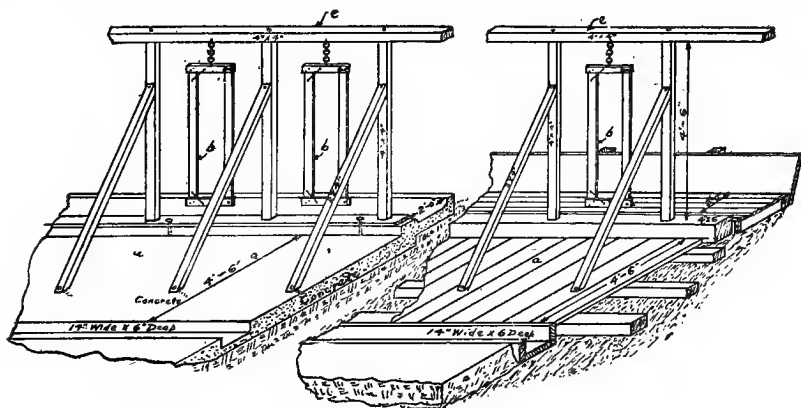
Arrangement of concrete and wooden stalls for cows.
